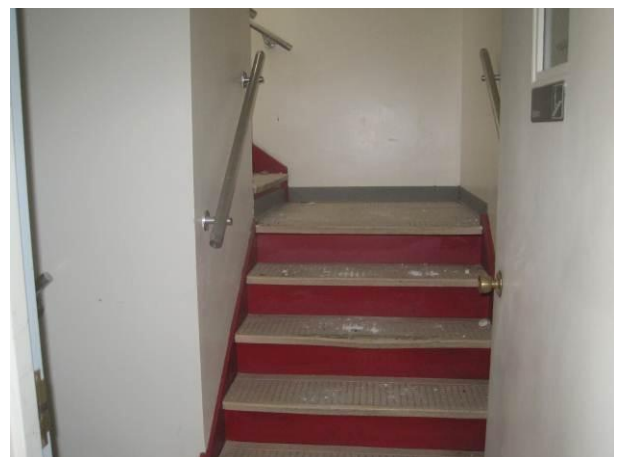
Asbestos-containing Ceiling / Wall Texture / Drywall / Joint Compound (Multicolor, Drag).
